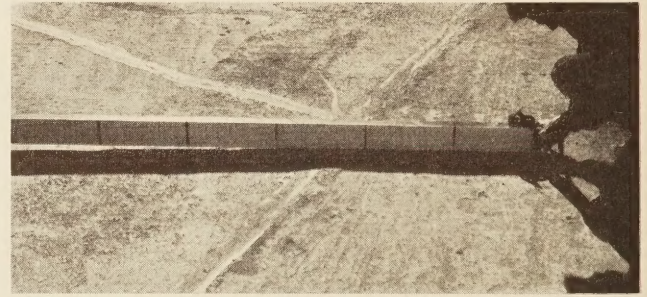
IMPACT REACTIONS PRODUCED ON A NEW CONCRETE BRIDGE BY SETTLEMENT OF FILL UNDER CONCRETE APPROACH
